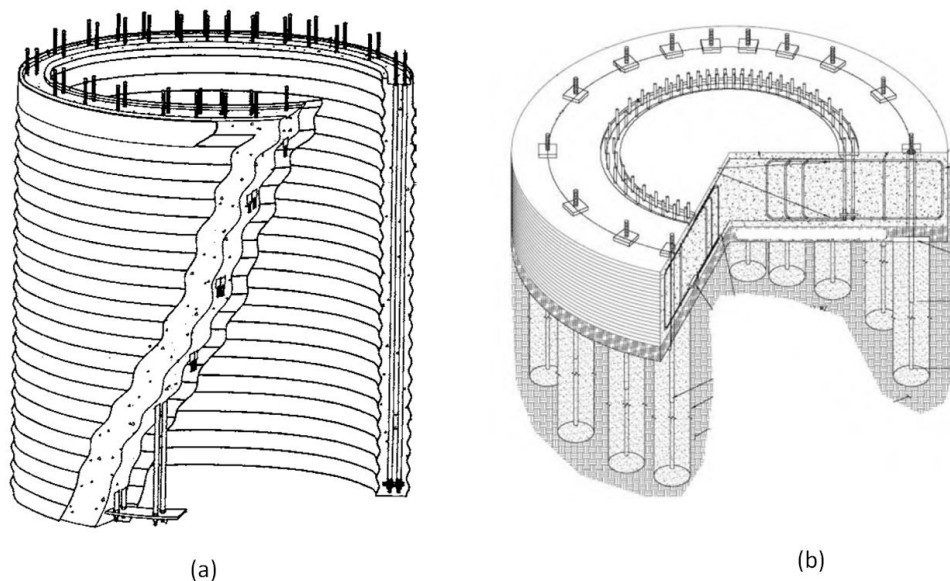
(a) Monopile foundation (b) Normal pile foundation (P&H, 2012)
